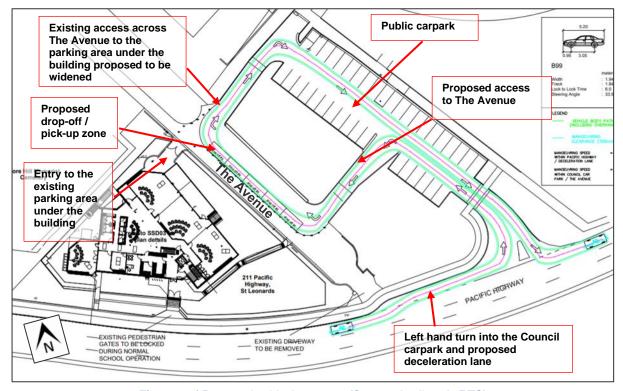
| Proposed vehicular access (Source: Applicant's RTS)
